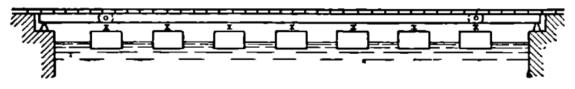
Diagram structure of a pontoon-separate floating bridge.
